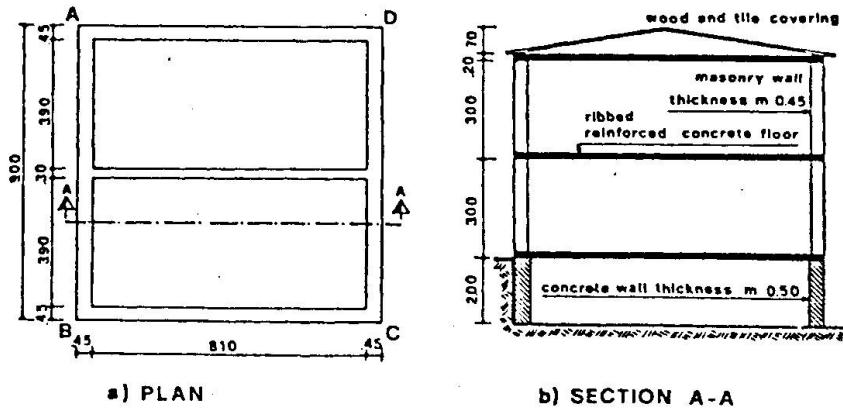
Structural scheme of the house near the Ambiesta dam.
